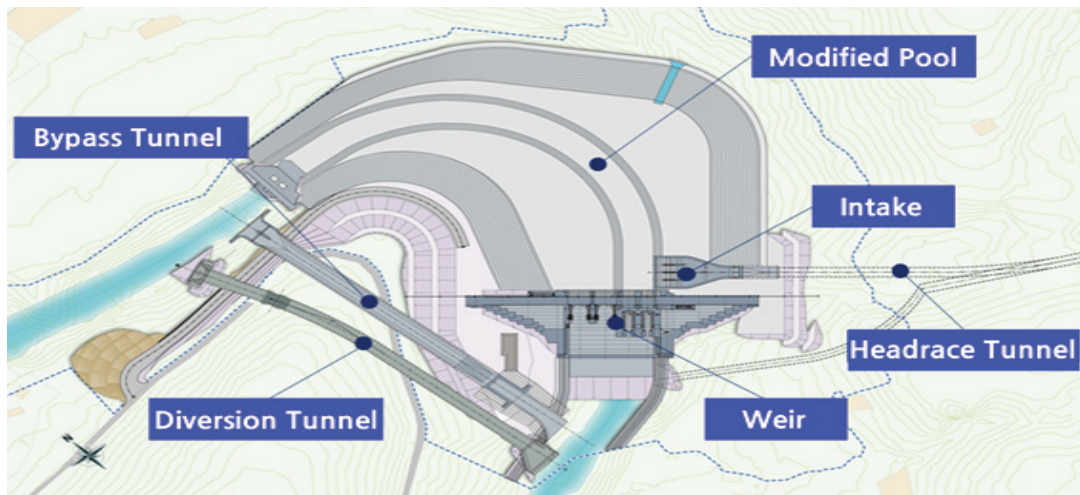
Layout of the Weir Site(Detail design, 2015)
